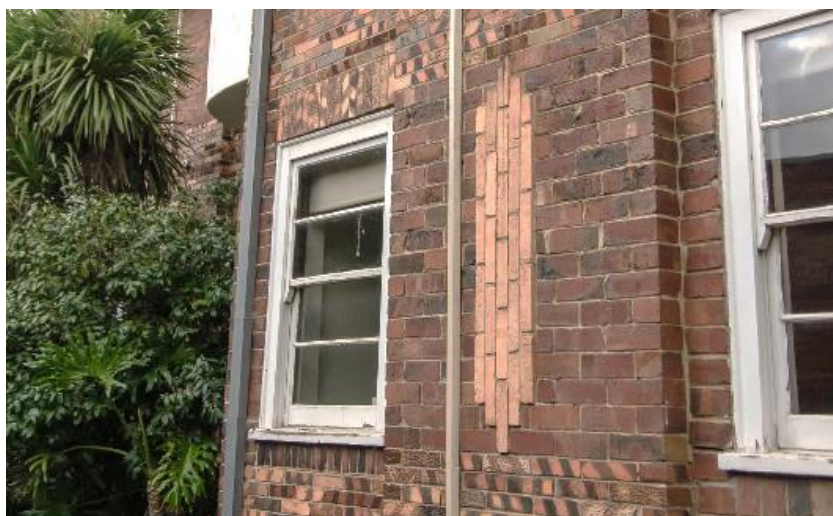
Showing details including the brick lintel, embossed cream brick detailing and timber-framed double-hung sash windows. (Source: Context, May 2020)
